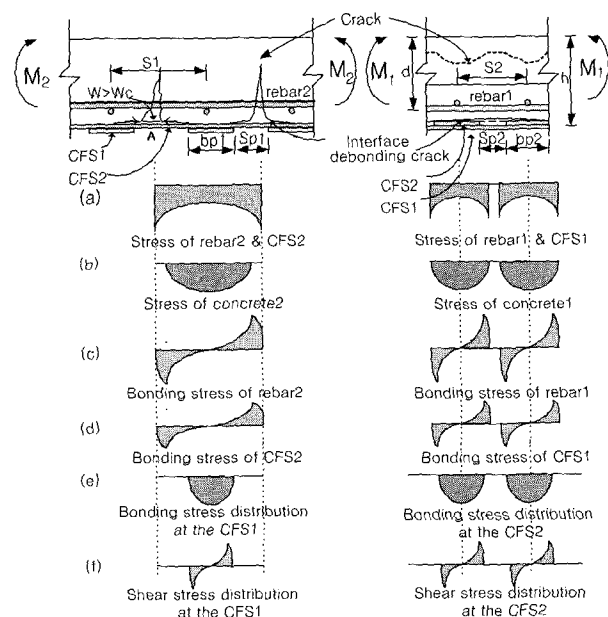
Stress distribution at the crack face of strengthened bridge deck
